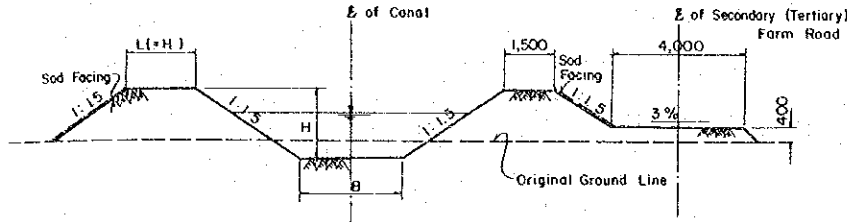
TYPICAL CROSS SECTION OF CANAL AND ROAD
